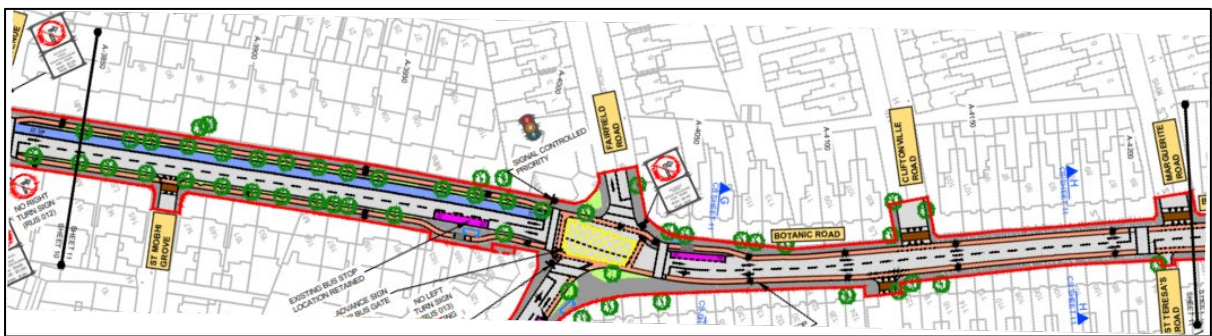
from General Arrangement Drawing Sheet 11
